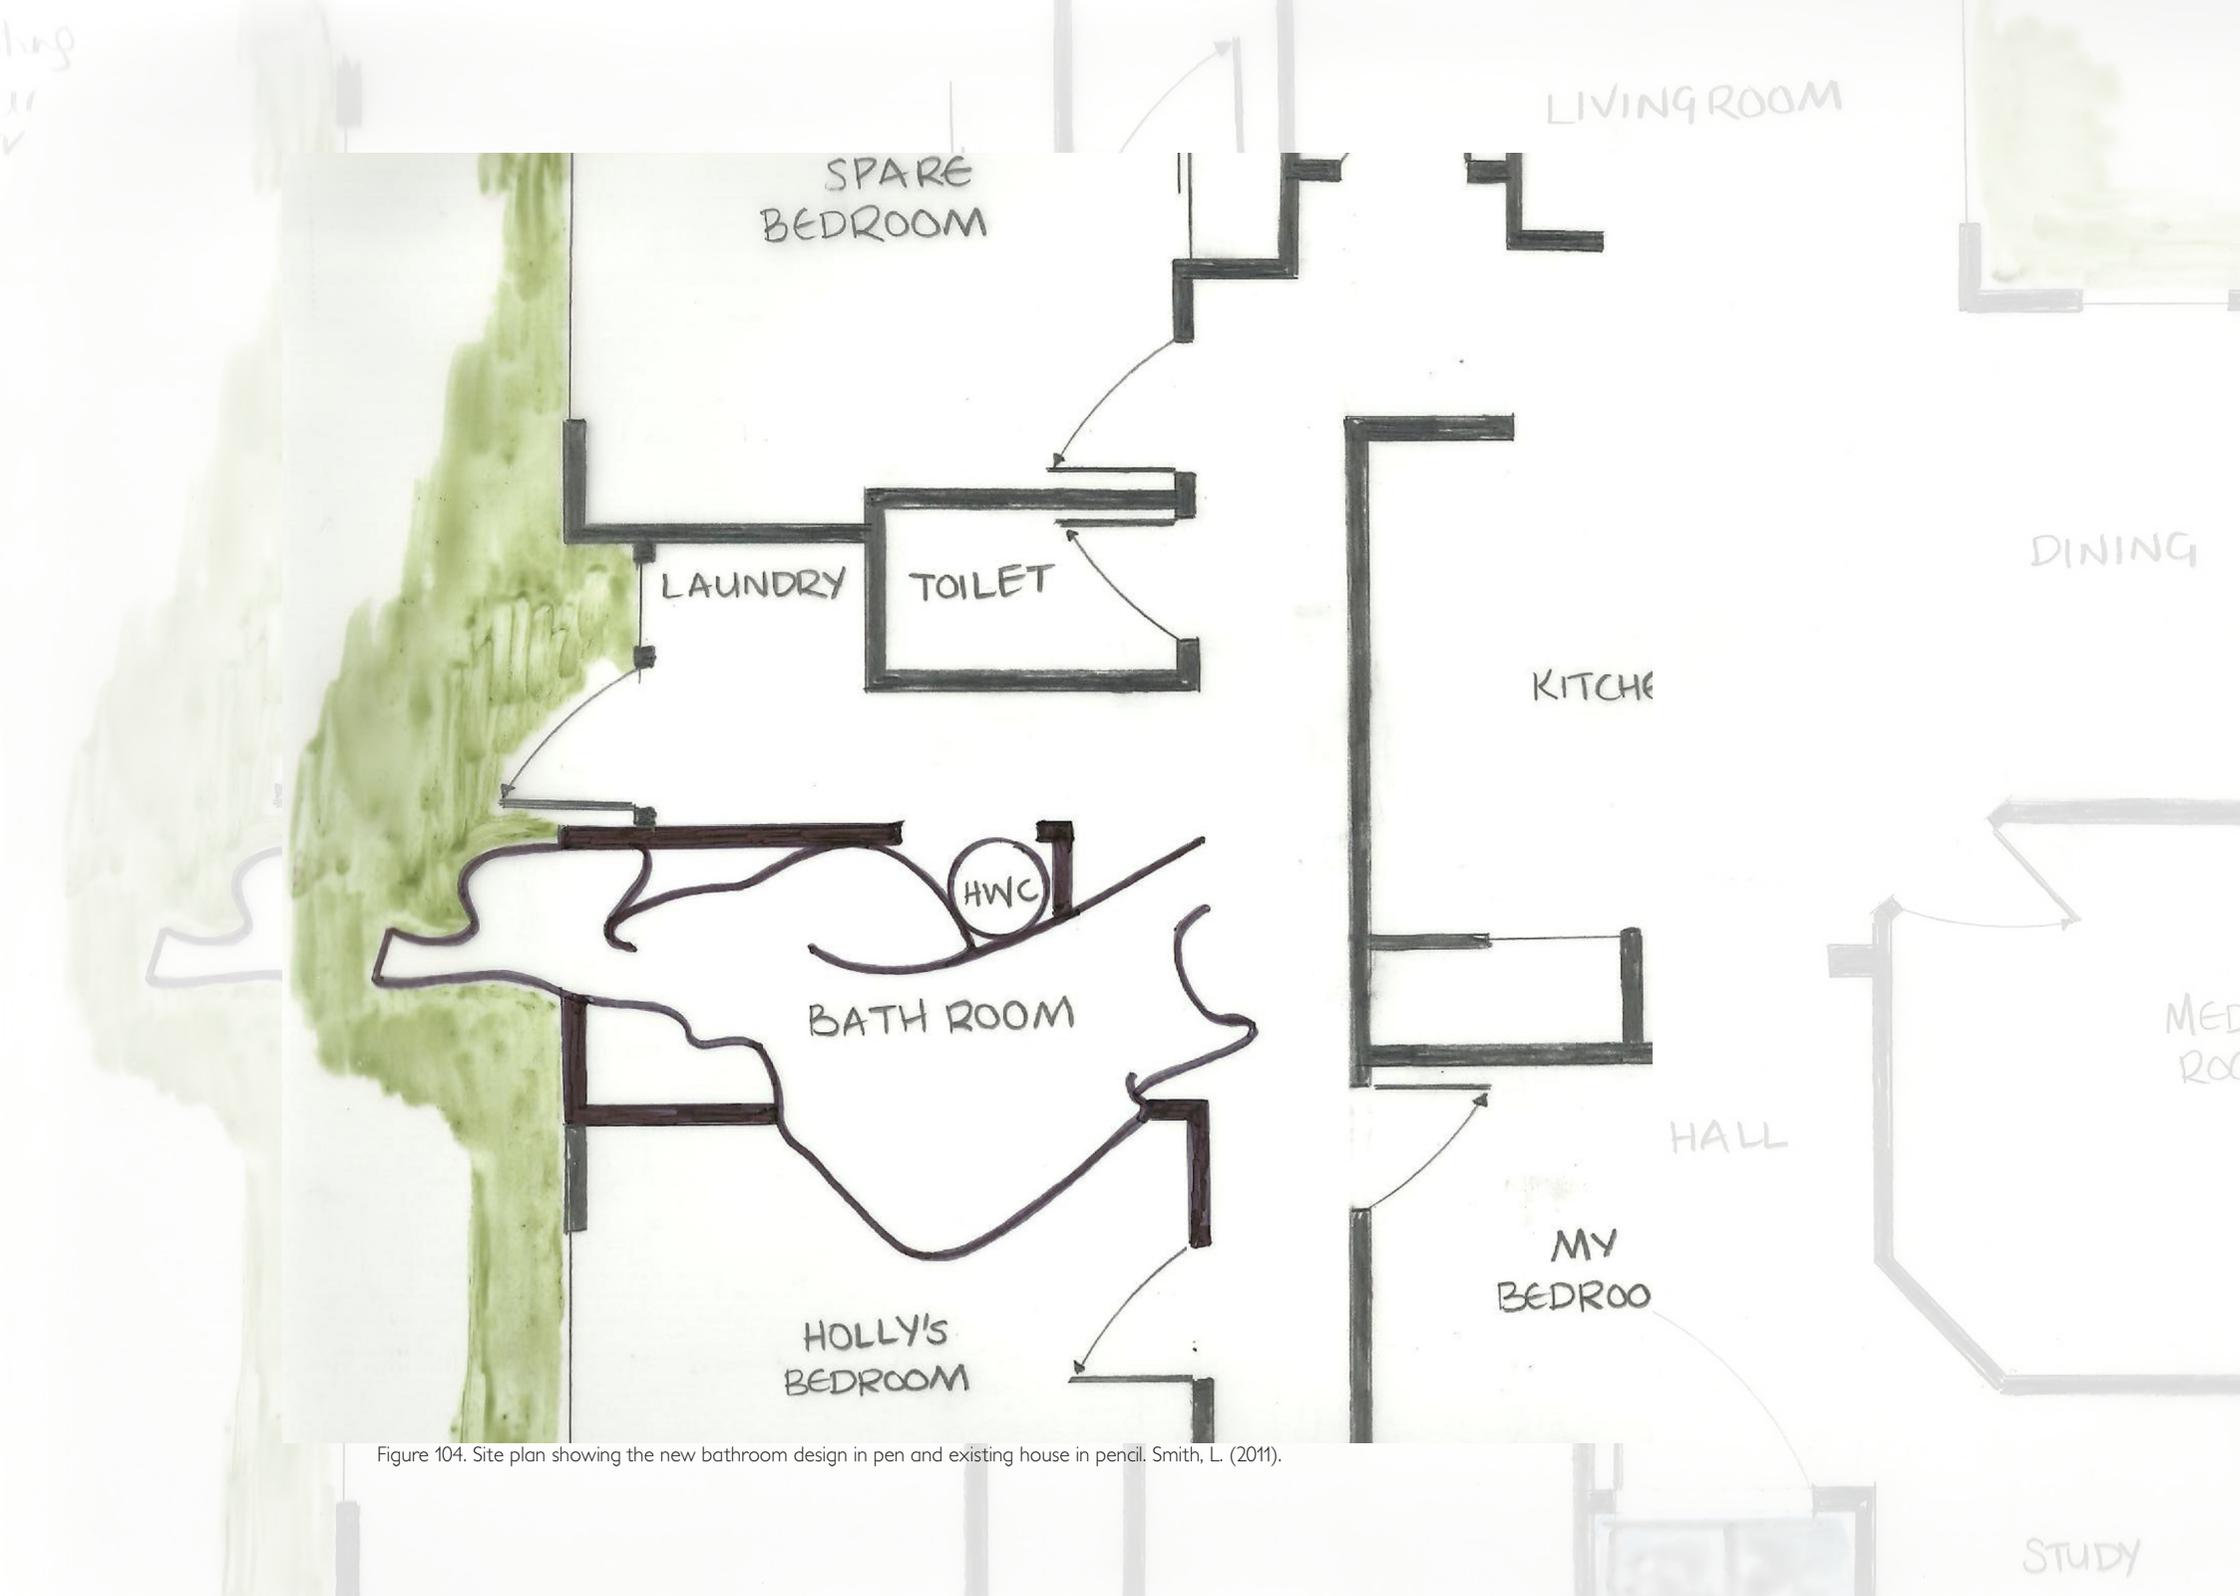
Site plan showing the new bathroom design in pen and existing house in pencil. Smith, L. (2011).
